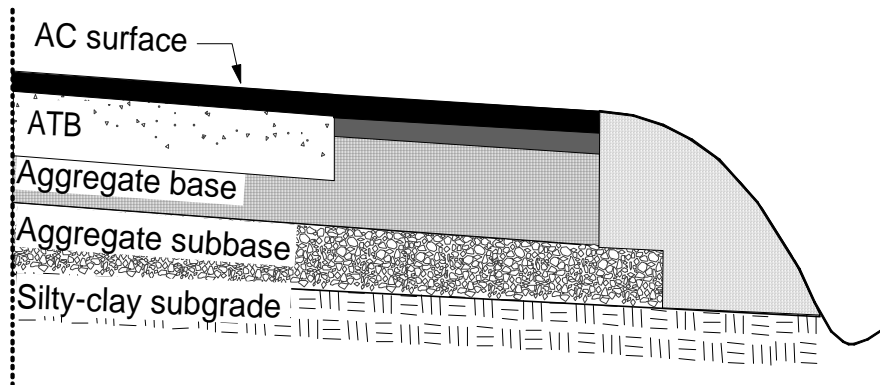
Typical undrained AC pavement section (ERES, 1999).
